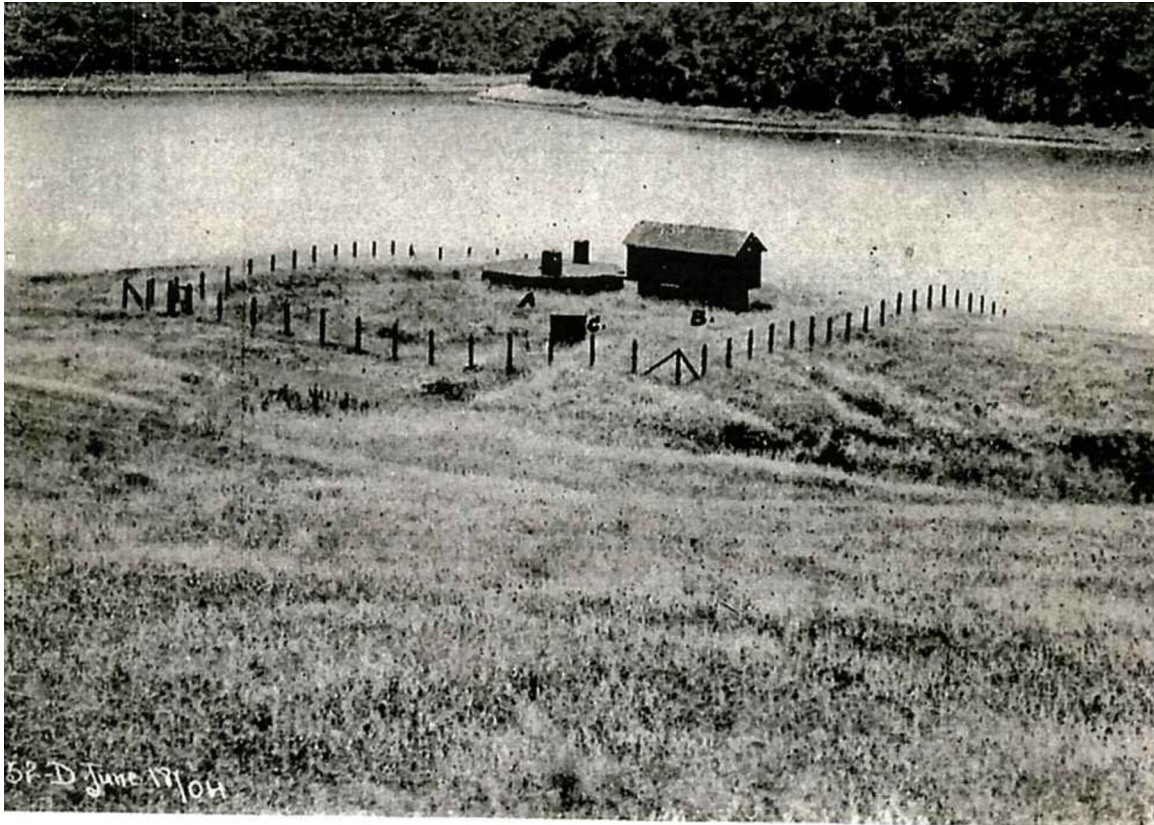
San Andreas Dam Outlet Works, looking Westerly (Credit Schussler 1906)
